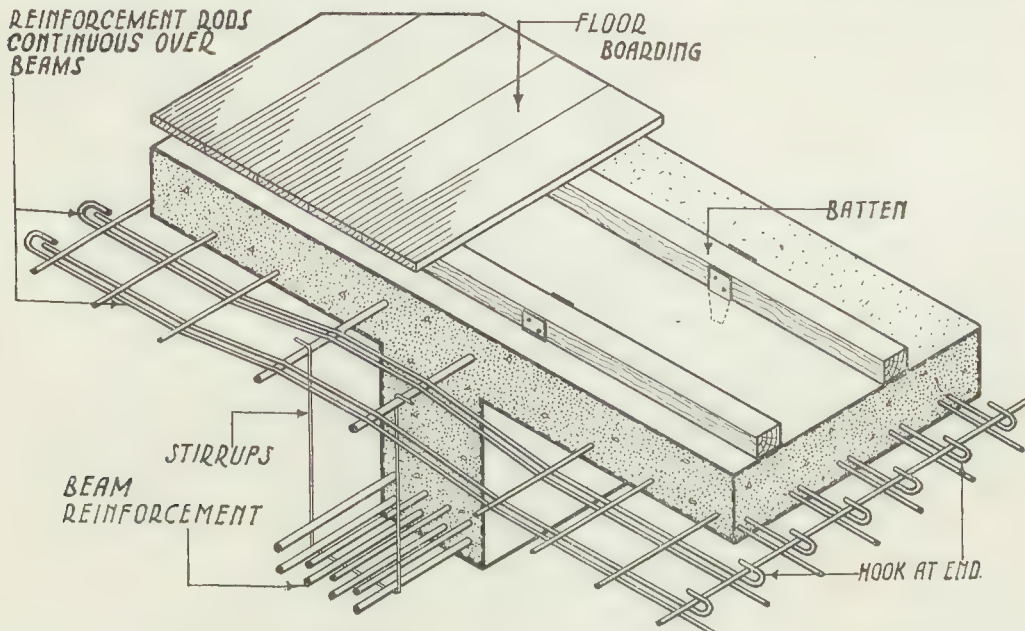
REINFORCED CONCRETE TEE BEAM AND FLOOR SLAB
